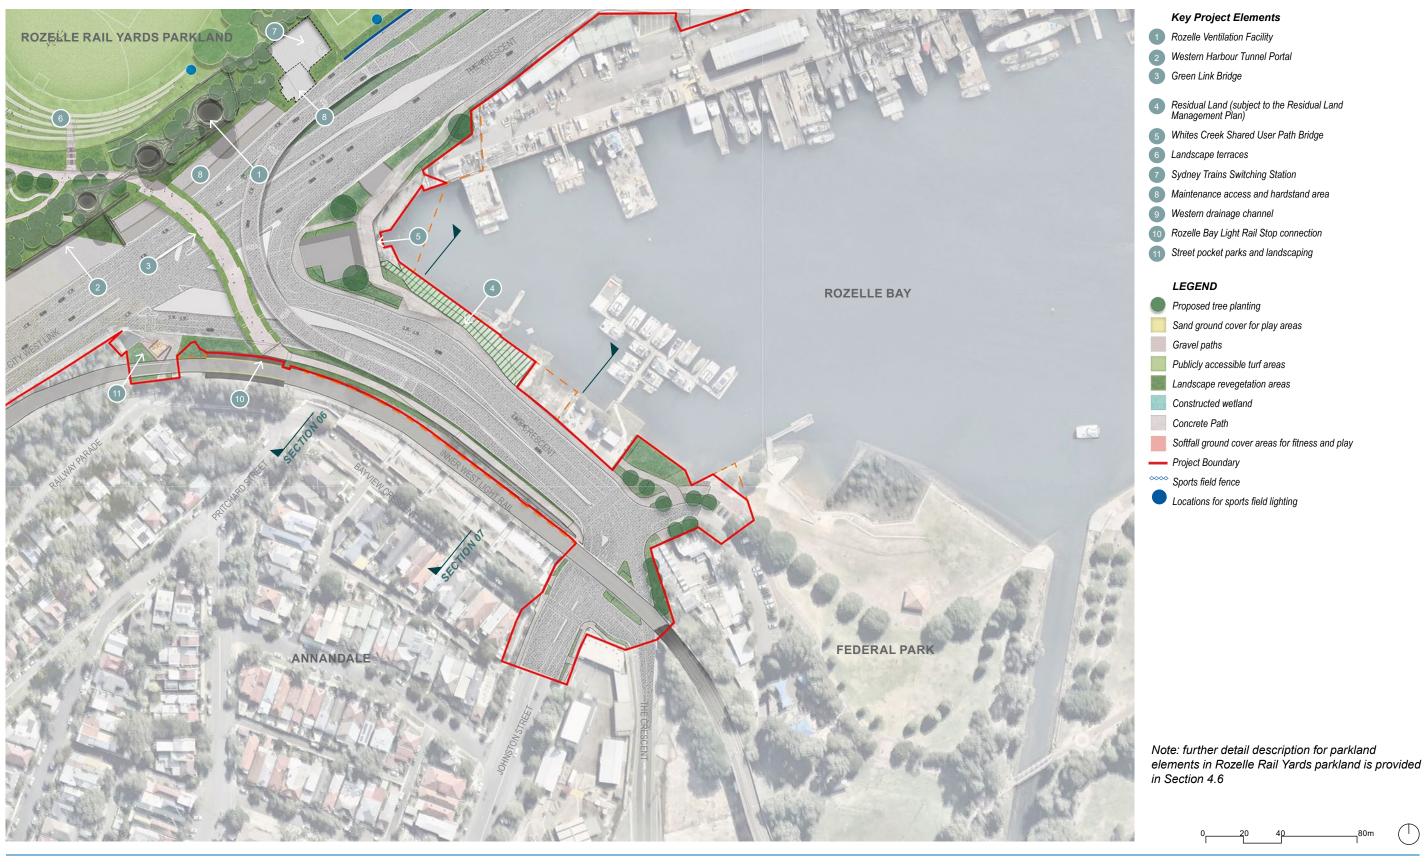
Rozelle - Concept Plan - Drawing 4 of 4
